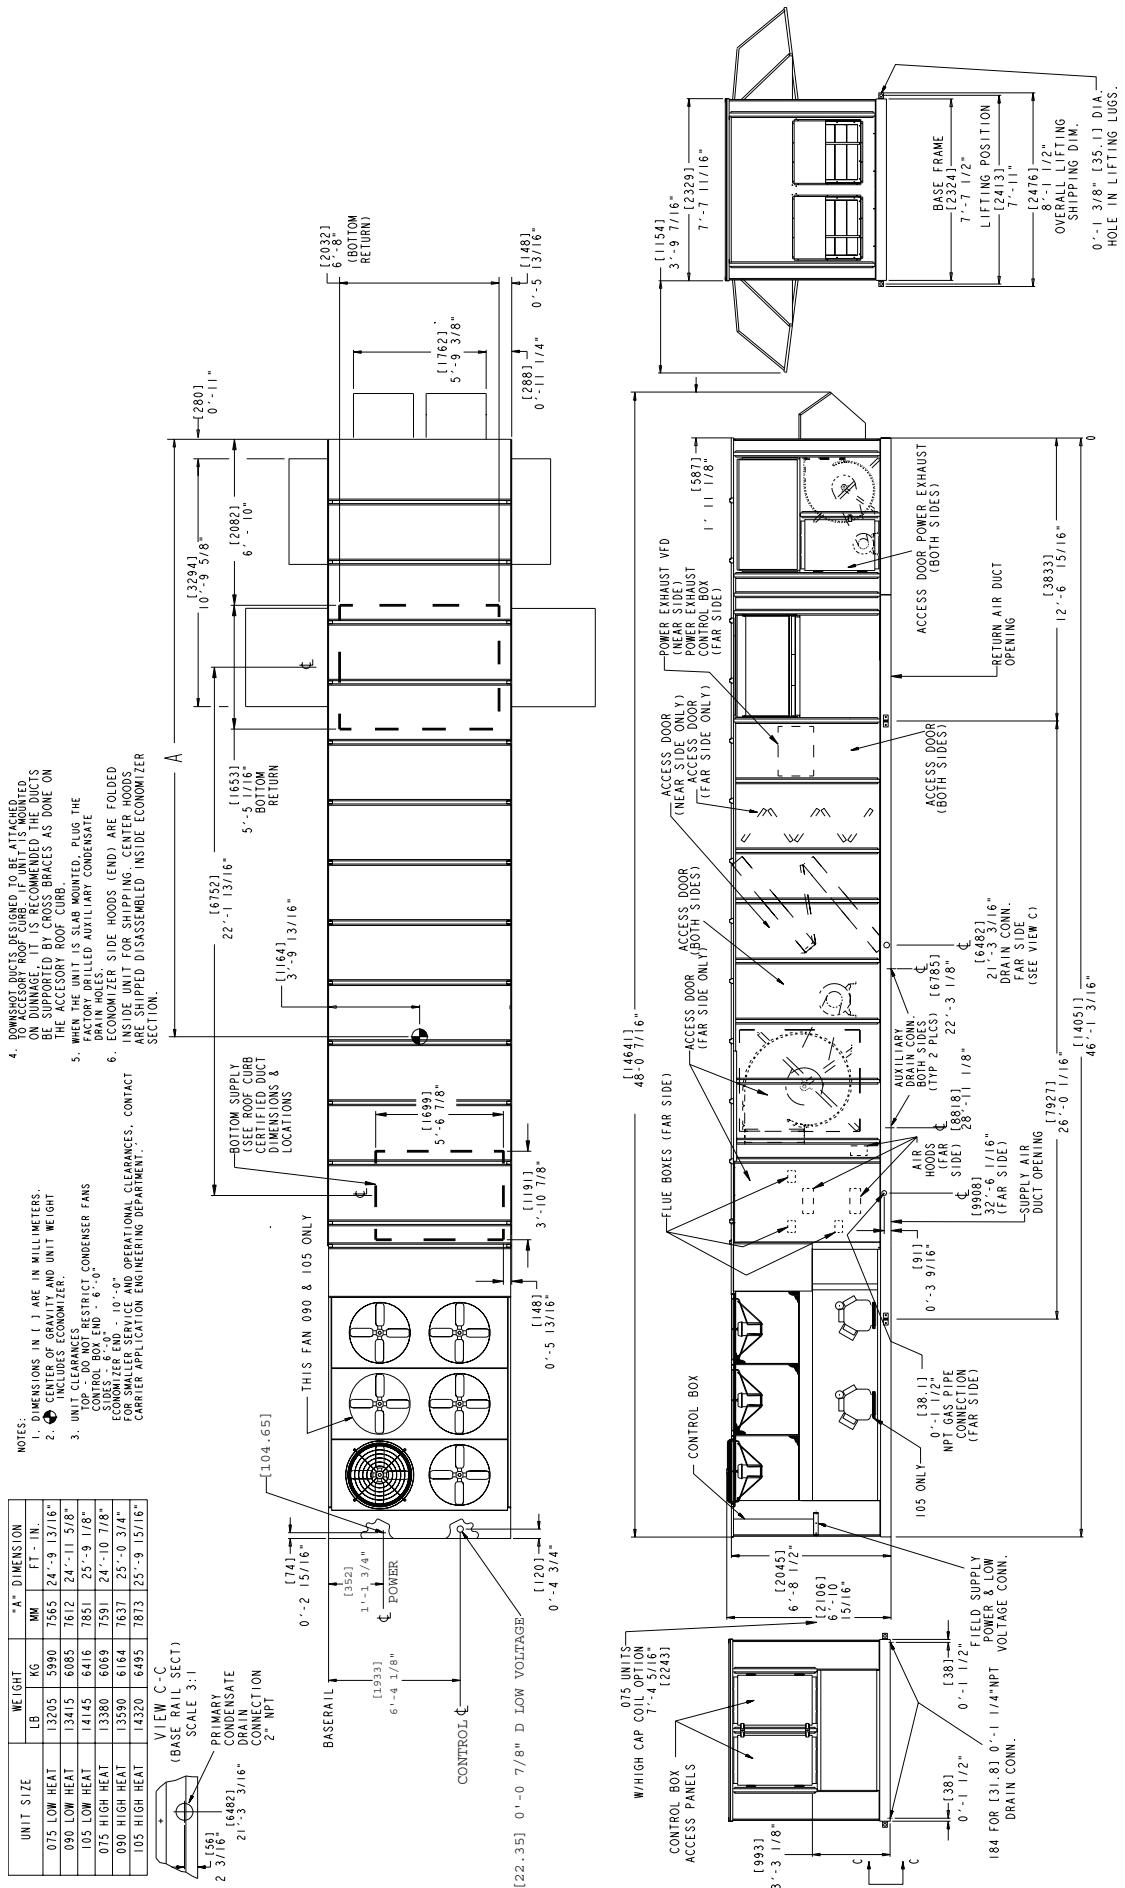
Base Unit Dimensional Drawing — 48ZT,ZW075-105 (Units with High-Capacity Power Exhaust)
